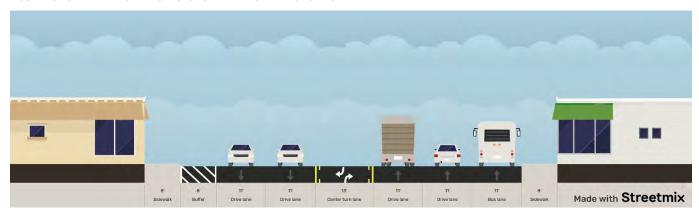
GRAND AVENUE TYPICAL SECTION 3: 23RD STREET TO 13TH STREET
